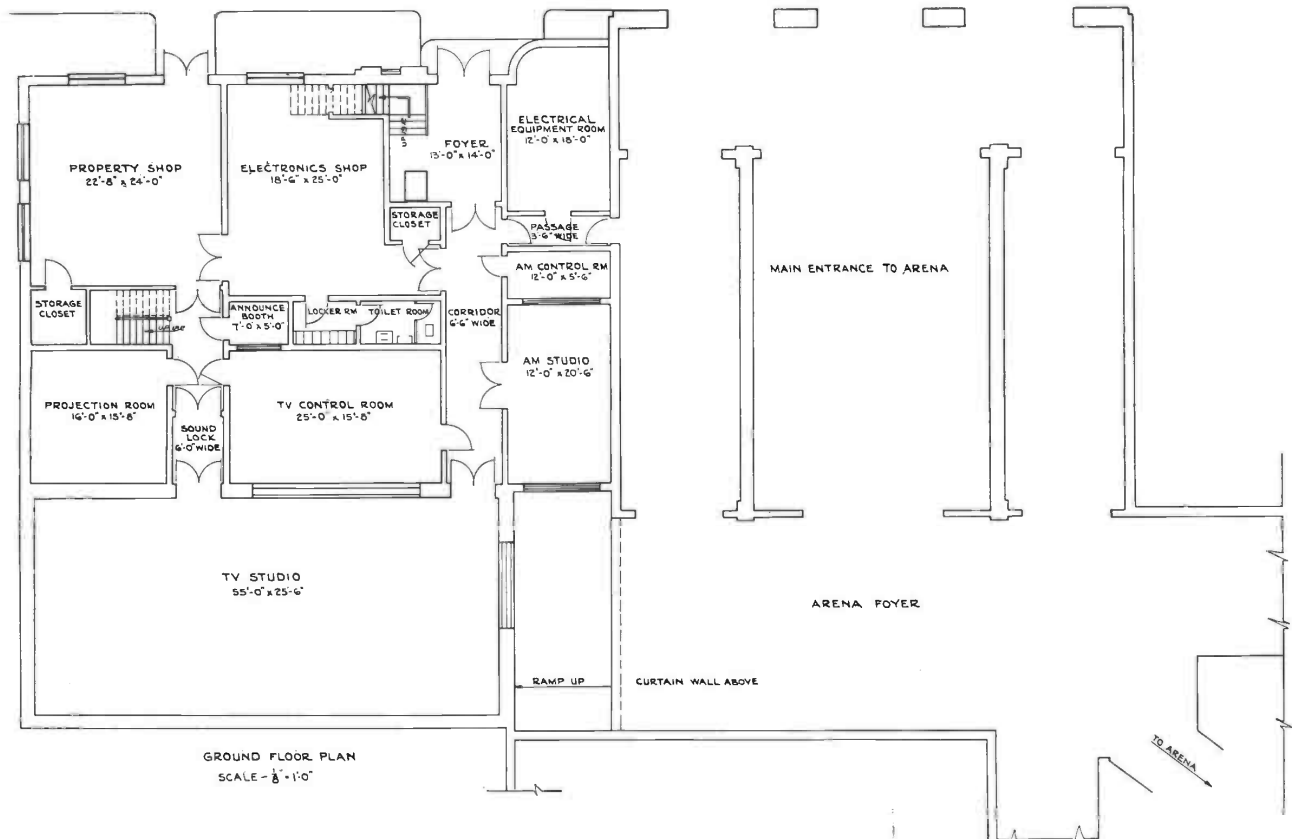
(above). Ground floor layout of the WFIL-TV studio building. The new building area embraces the lefthand half of this drawing. The part at the right is the entrance area of the sports arena which the new building adjoins, and which is owned by the Philadelphia Inquirer.
